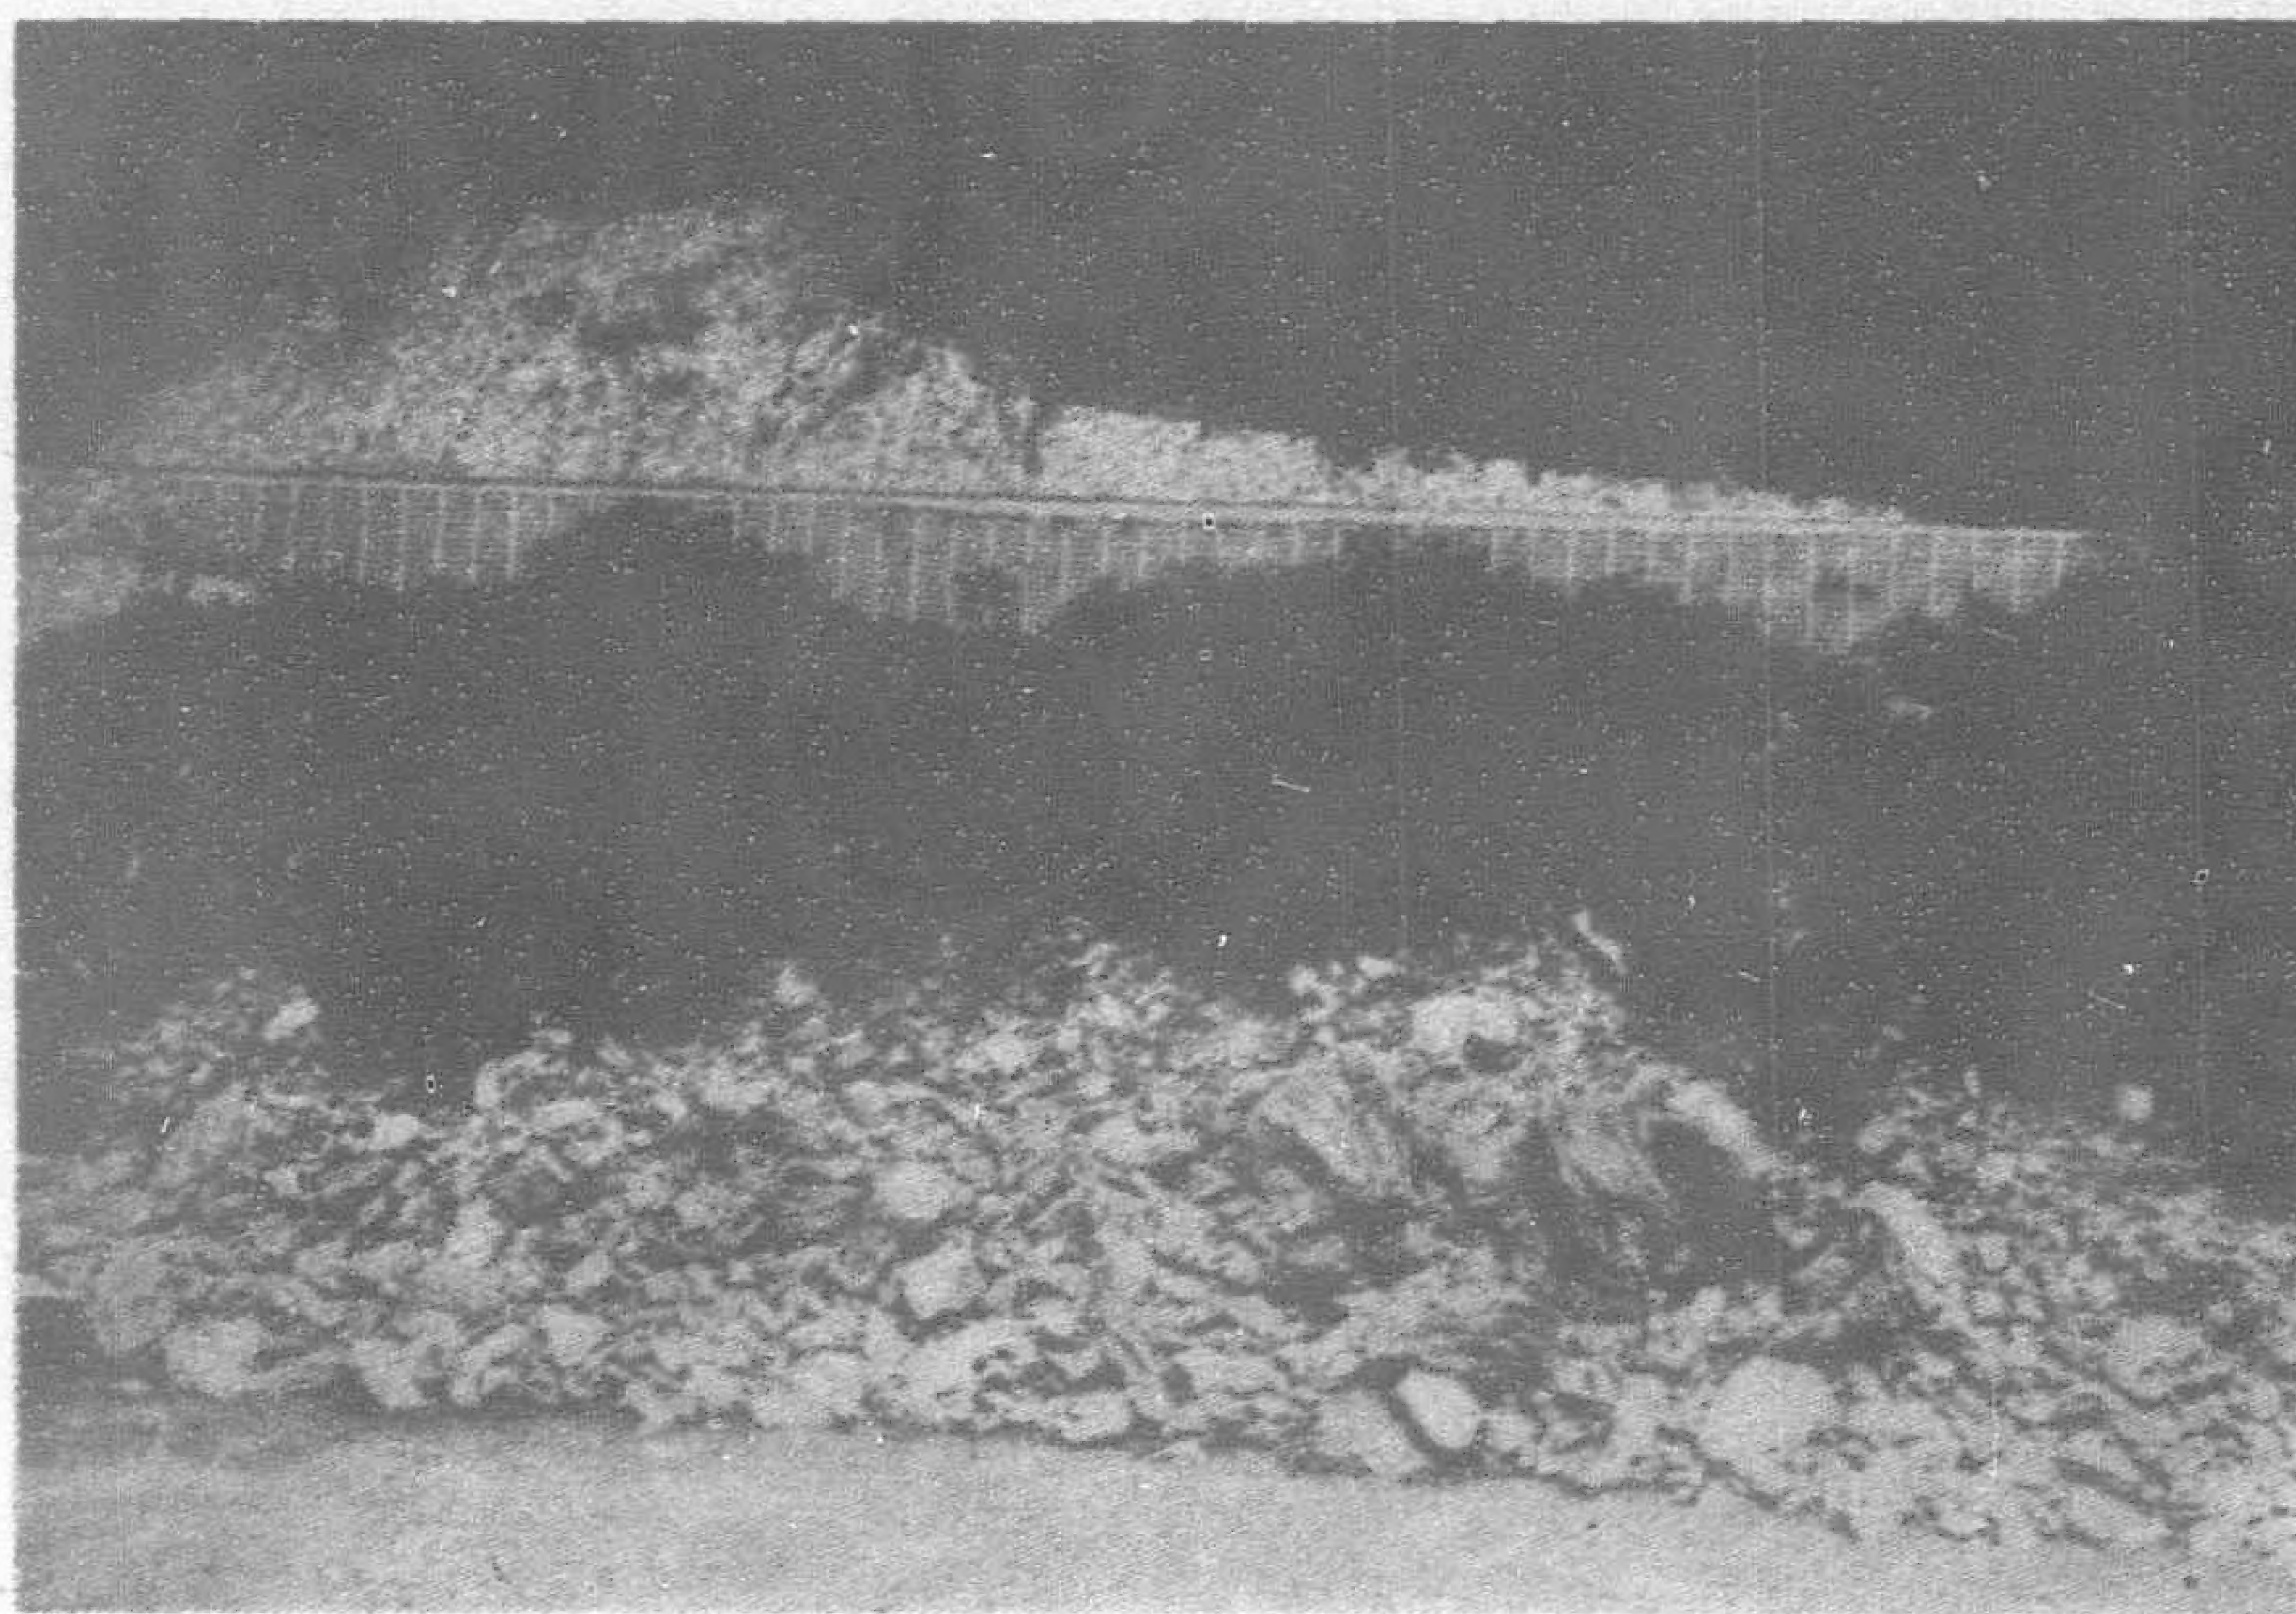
The Tosan line in Shikoku, showing special ground walls in which blocks of reinforced concrete have been laid cross-wise
